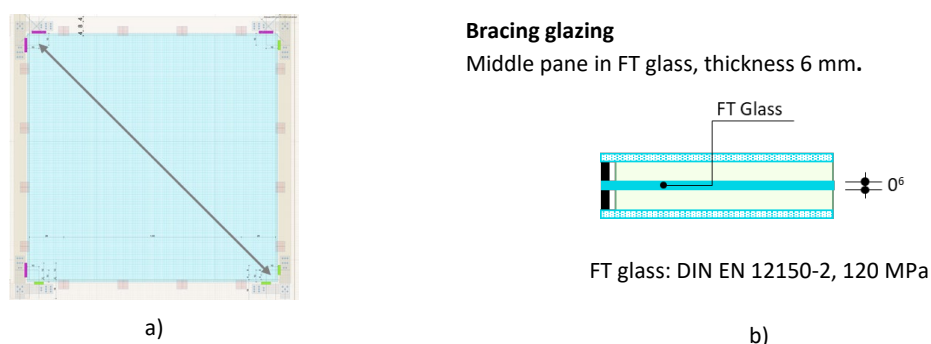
Test specimen: a) system configuration, b) cross-section of the glazing assembly.
